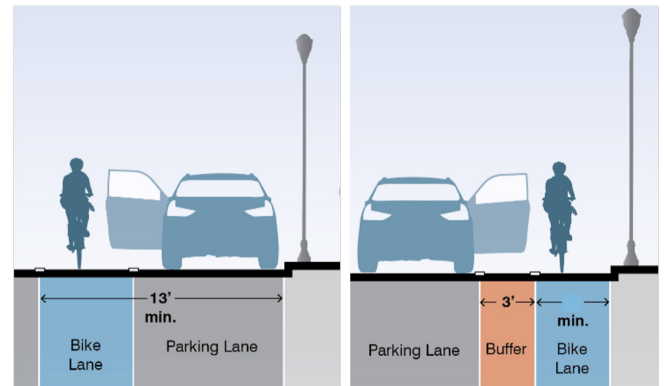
Bike Lanes and Parallel On-Street Parking
